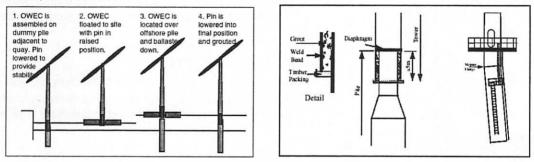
Installation of fully operational turbine and connection details between foundation pile and tower with misalignment correction
